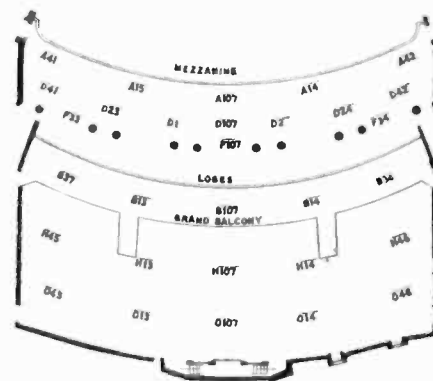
SEATING PLAN OF MEZZANINE AND BALCONY
